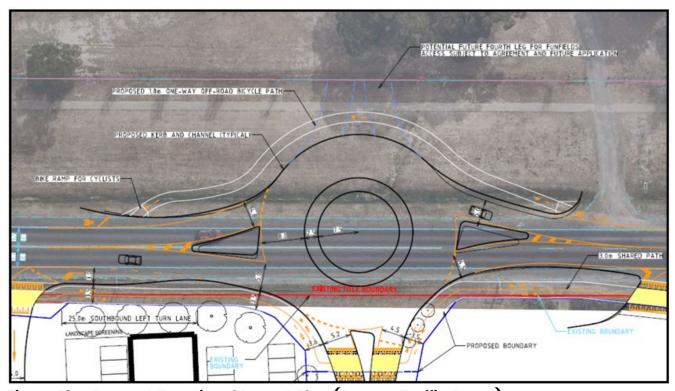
Concept Functional Layout Plan (Source: Traffix Group)
